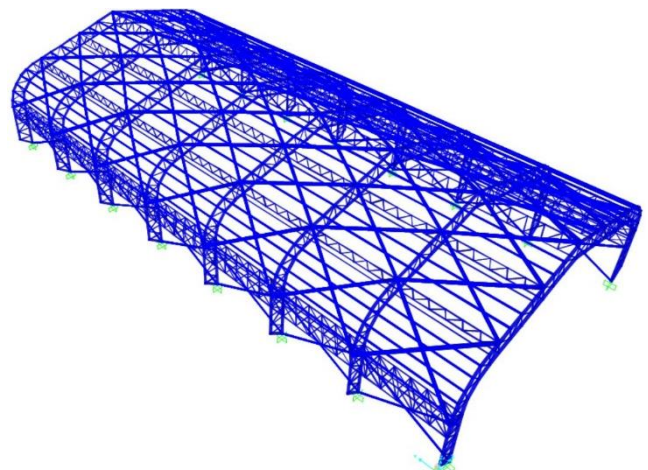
3D view of real-size steel truss structure modeled in SAP2000.
